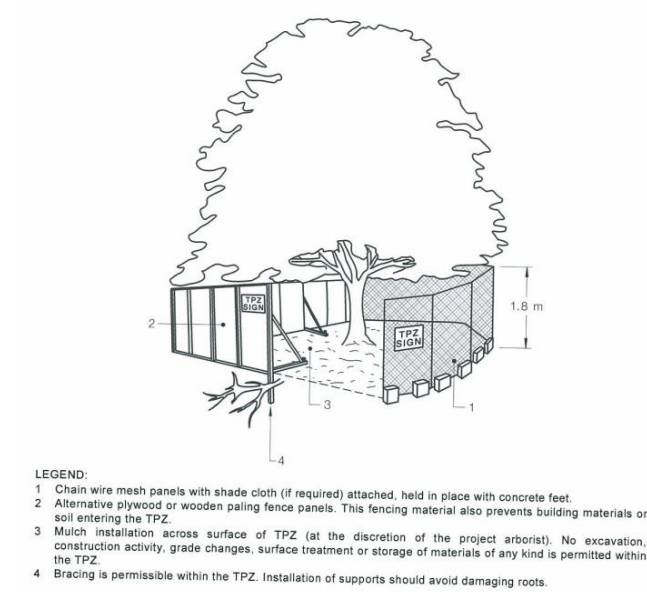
Details of tree protection measures (Section 4.4 AS4970 2009)
